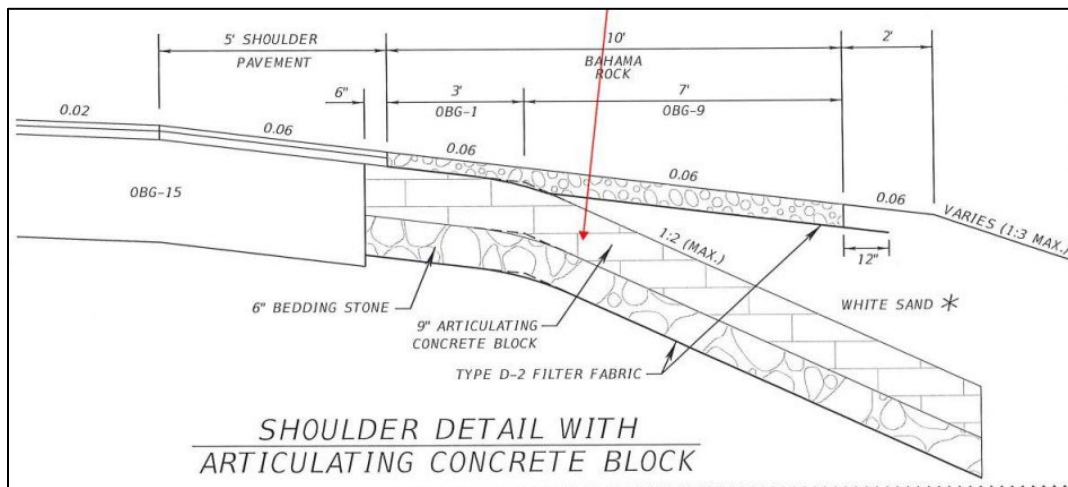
As-built plan of roadway shoulder with an articulating concrete block system. Source: FDOT
